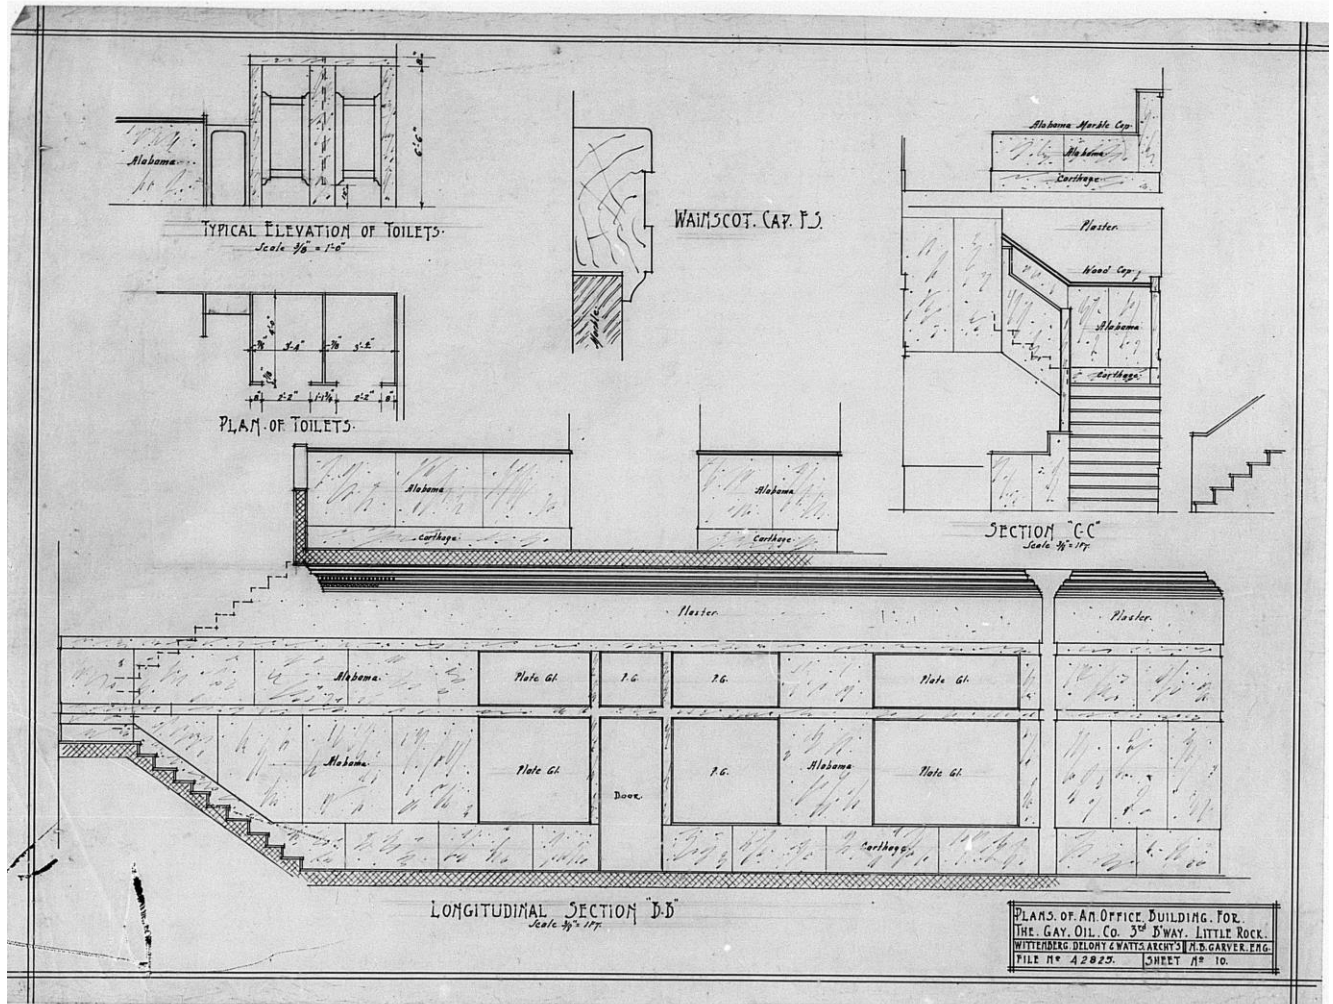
Section and Wainscot Detail Drawings for the Gay Oil Company Building
